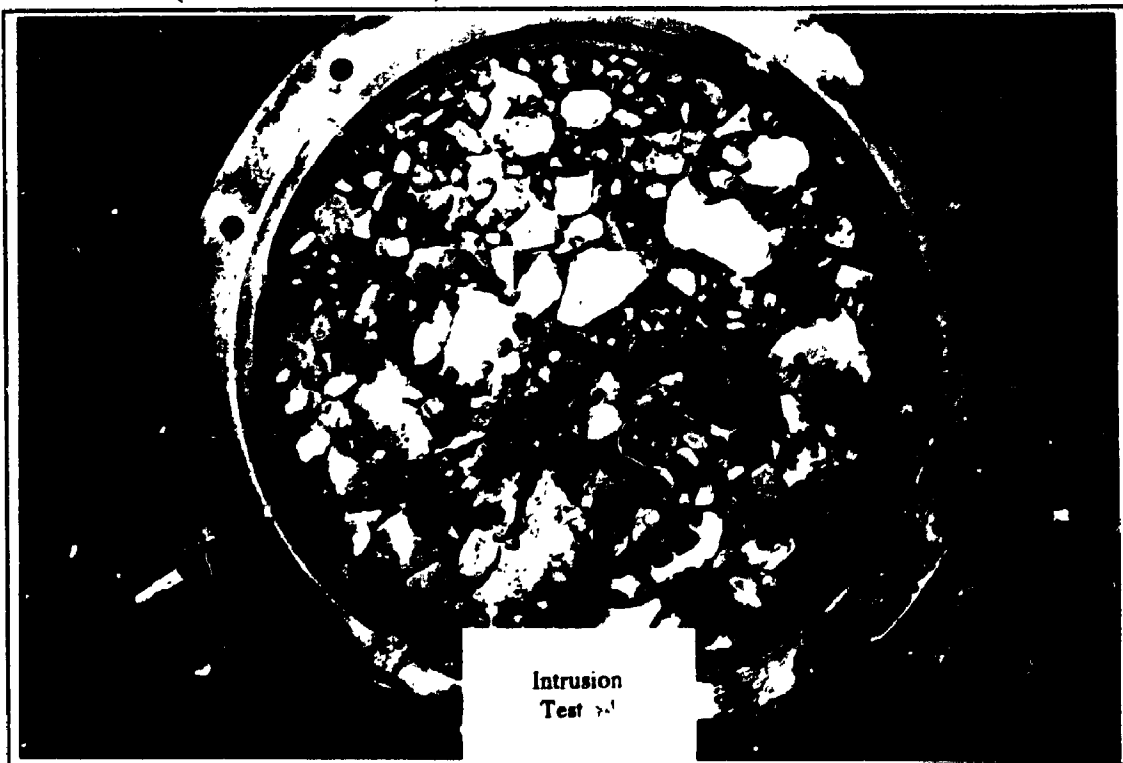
RIVER GRAVEL (20 mm) WAS PLACED OVER 50 mm STONE TO PROVIDE SMOOTH SURFACE FOR BASE PLATE
